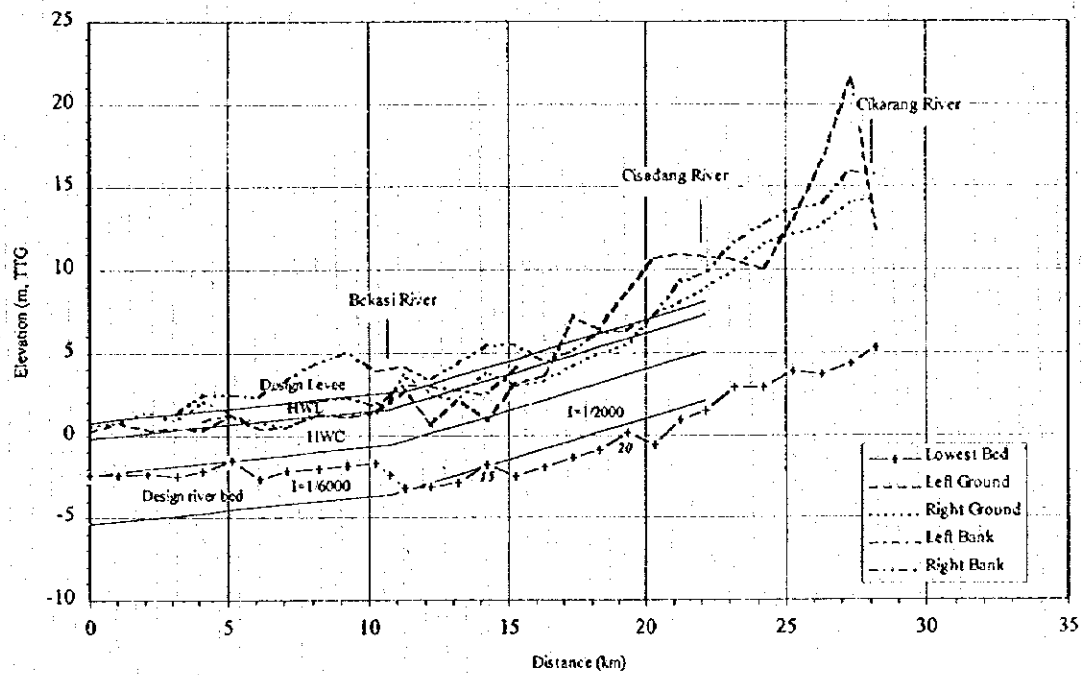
PROPOSED LONGITUDINAL PROFILE AND CROSS-SECTION (10/13)
